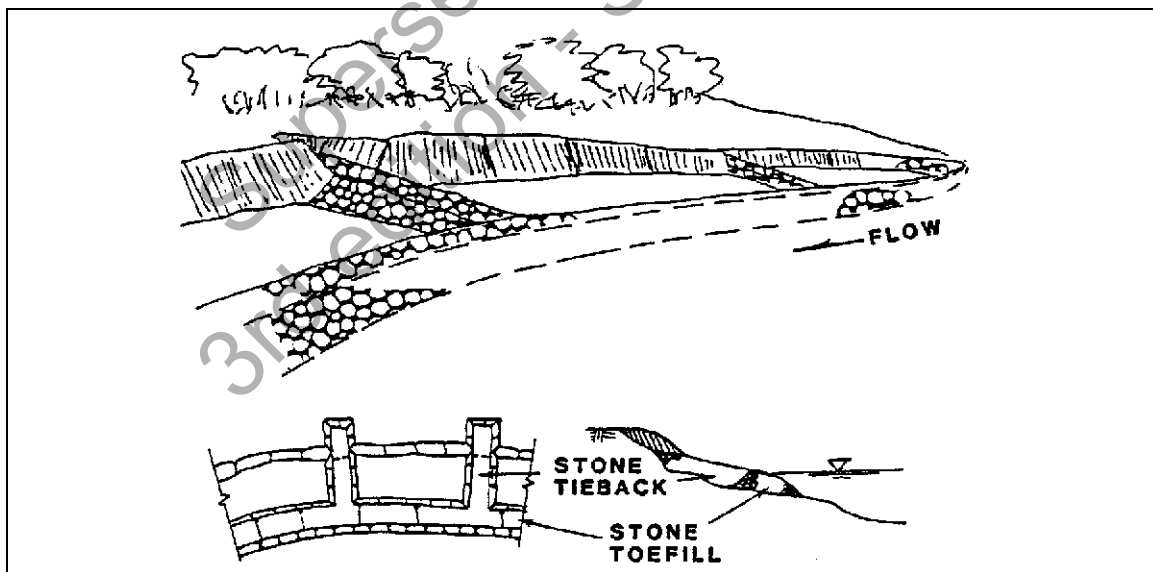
Longitudinal rock toe-dike tiebacks (after Brown).⁽²⁾
